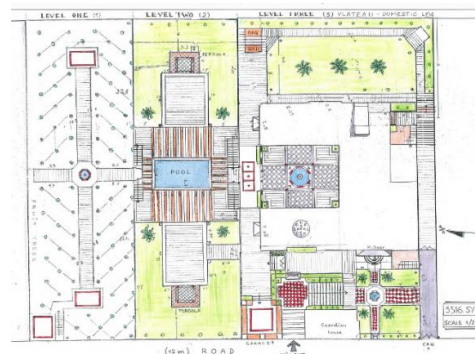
General site plan of AL-Cantara house in the suburban of Damascus (Touma, 2011).
